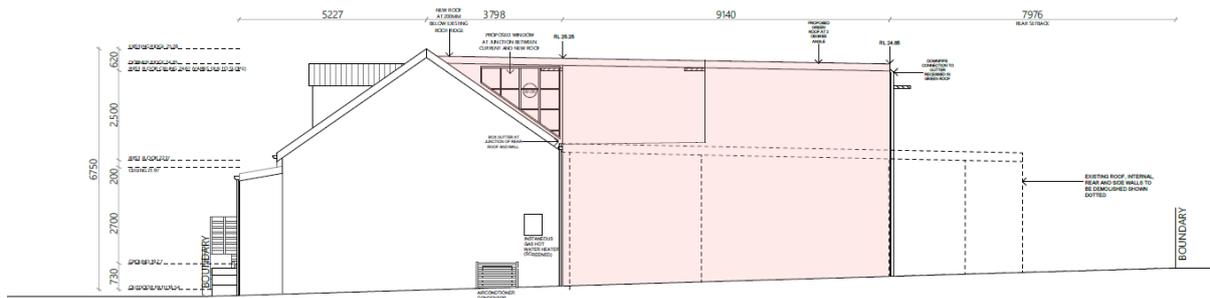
Proposed South Elevation (extent of new works outlined in red)
